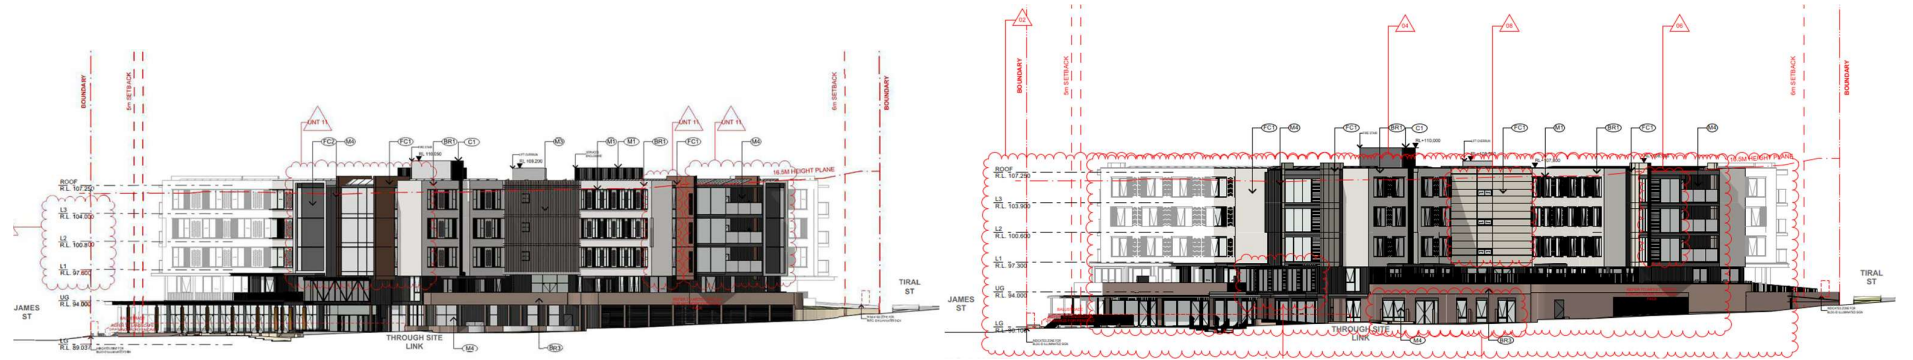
Approved and Proposed West Elevation of Building A (2 of 2)
